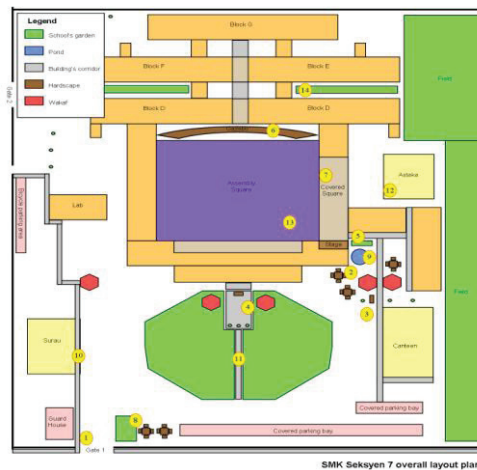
Layout plan of School 1- SMK Seksyen 7(not to scale)
